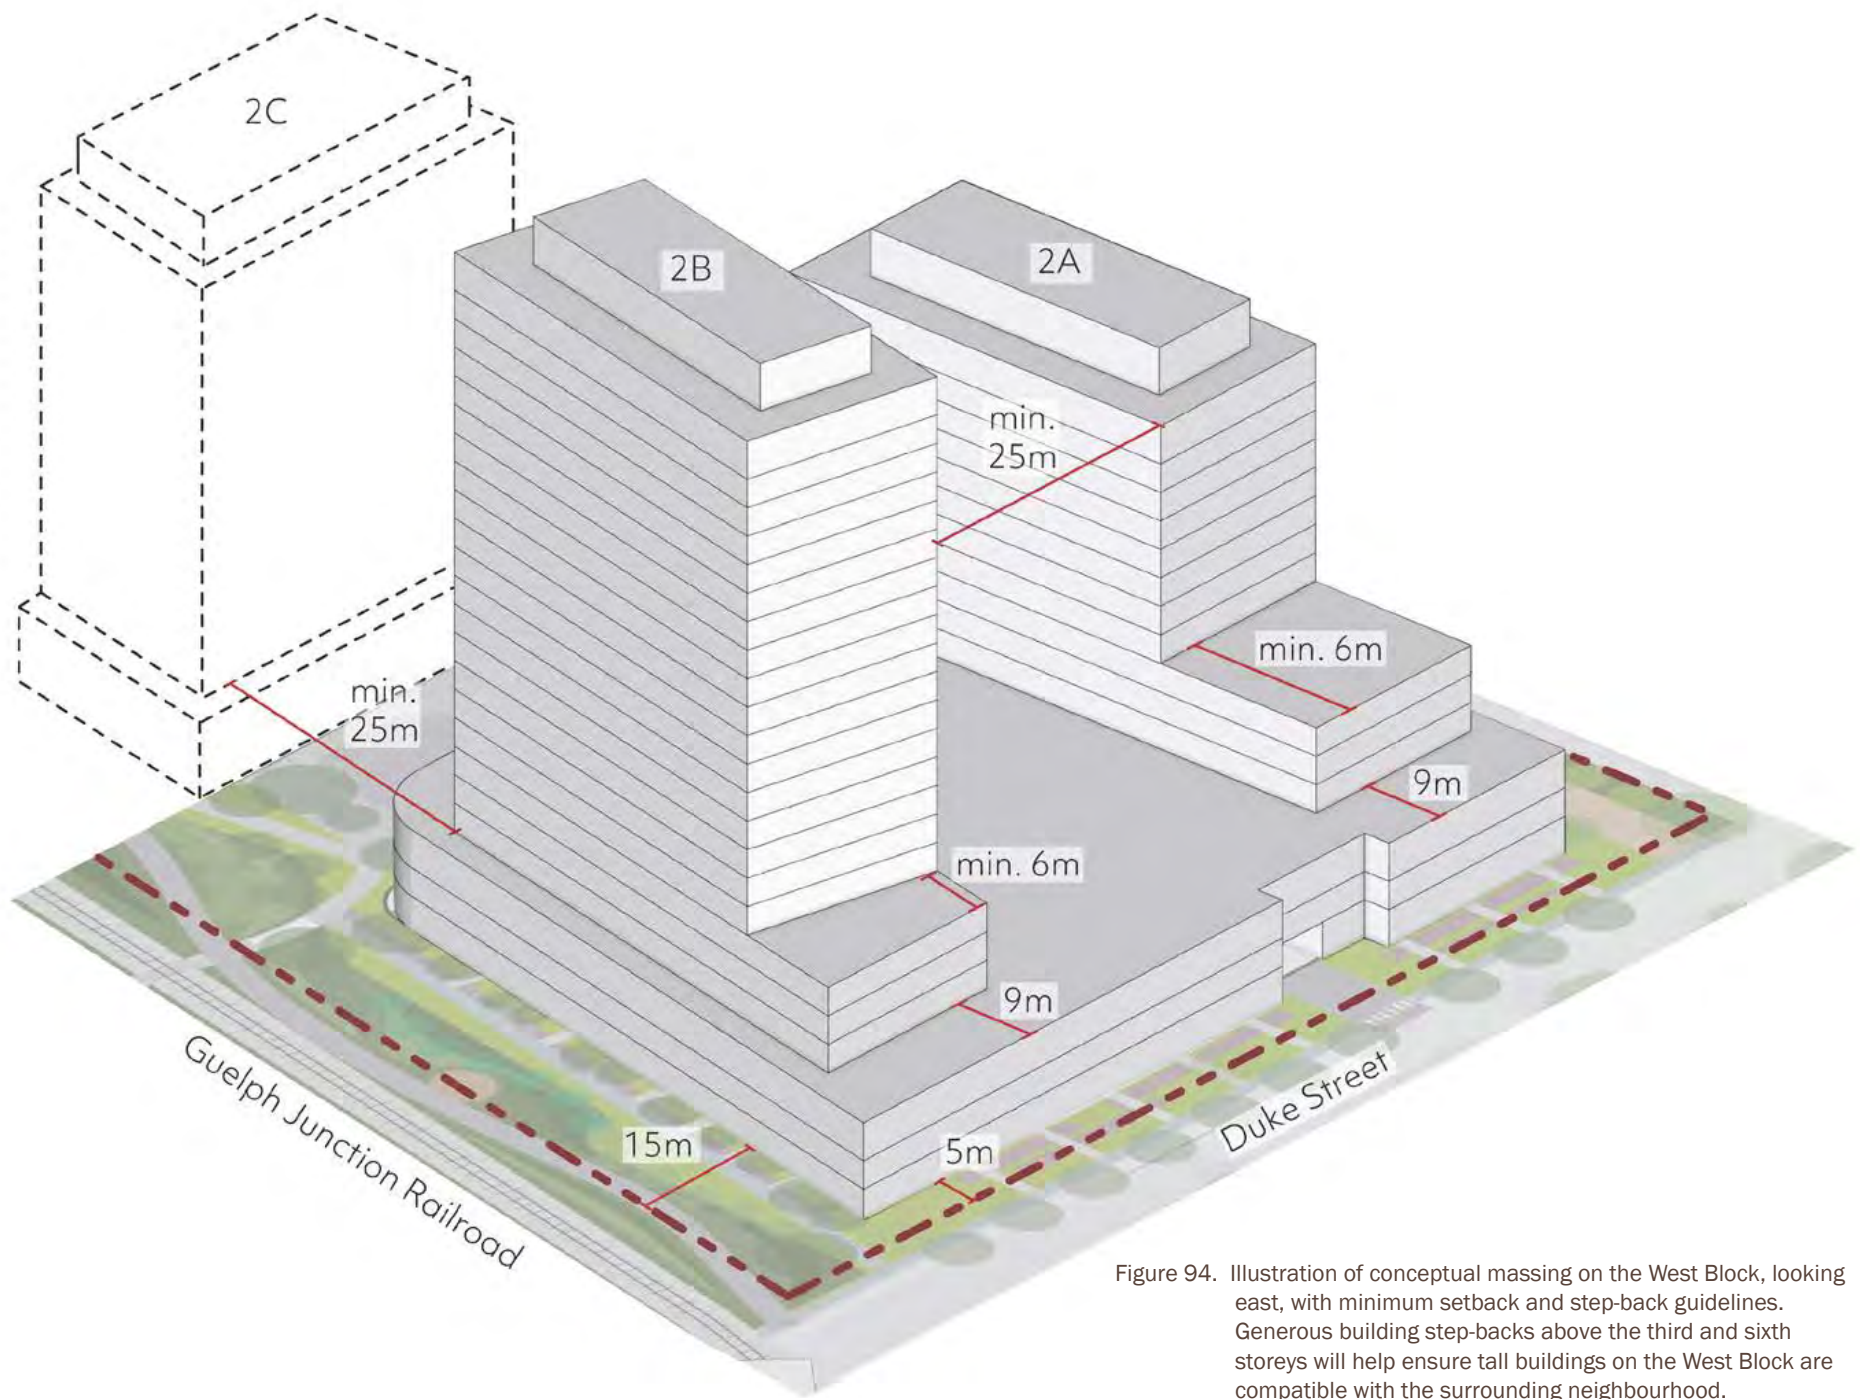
Illustration of conceptual massing on the West Block, looking east, with minimum setback and step-back guidelines. Generous building step-backs above the third and sixth storeys will help ensure tall buildings on the West Block are compatible with the surrounding neighbourhood.
